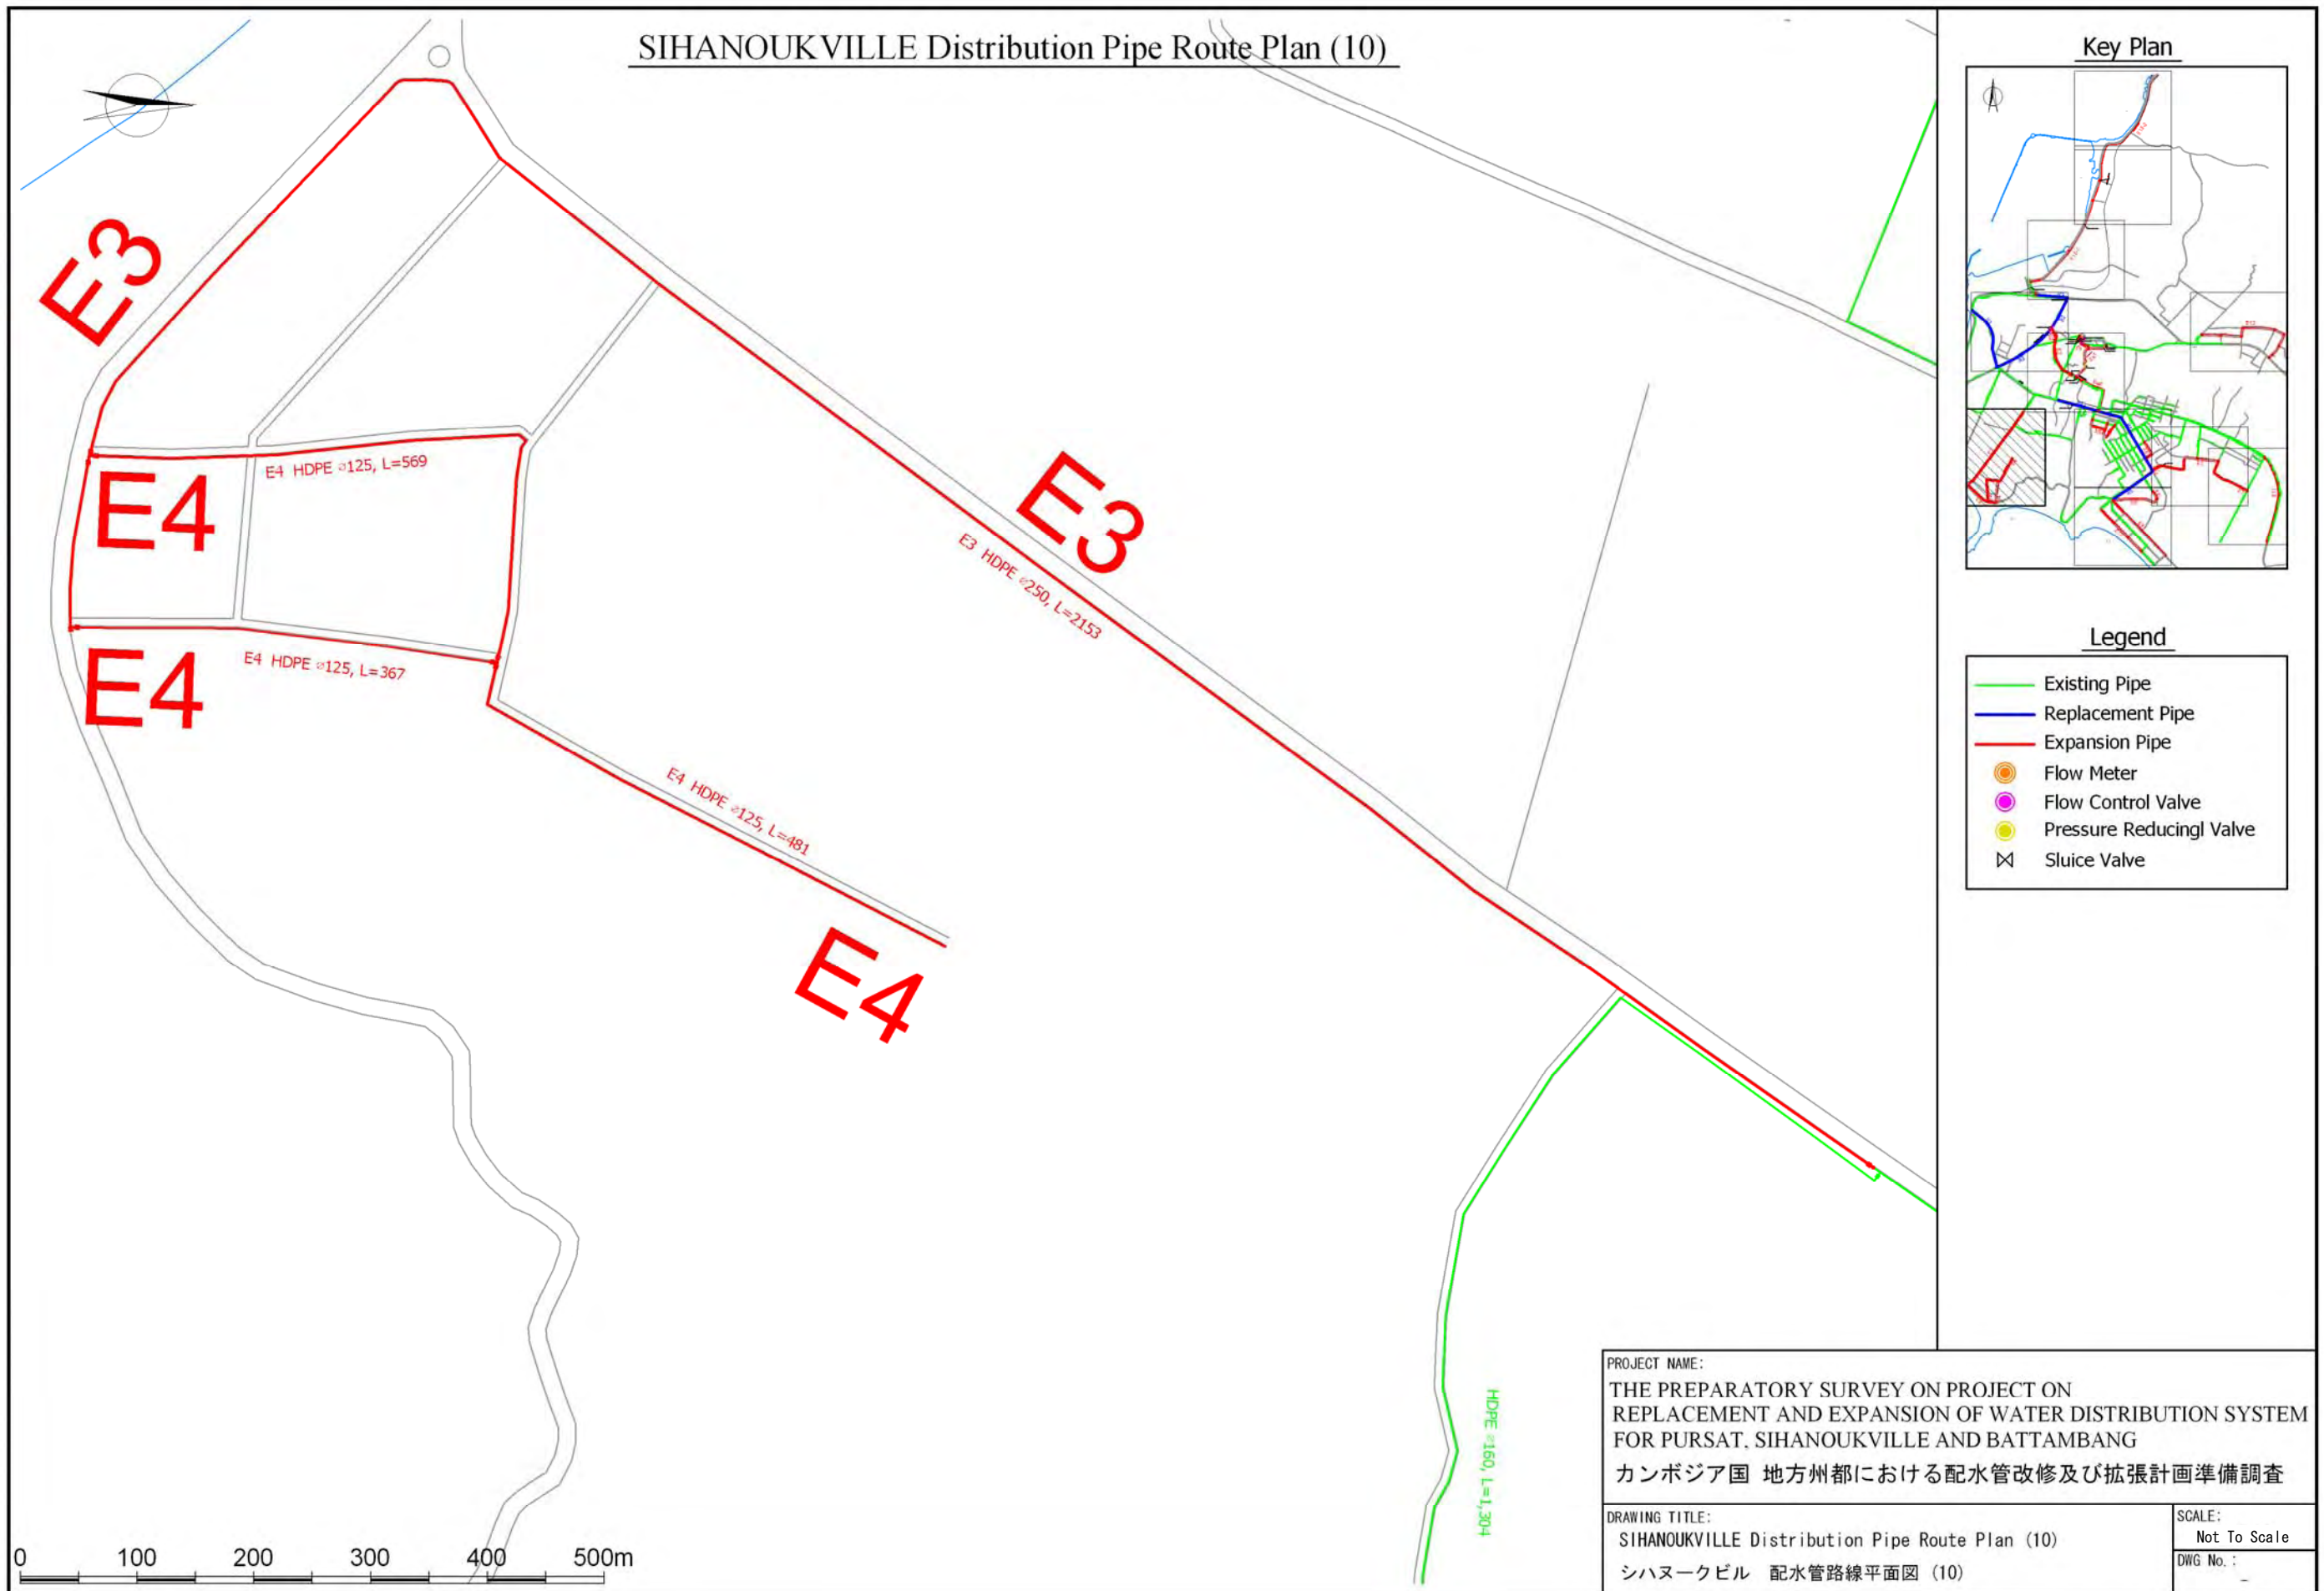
SIHANOUKVILLE Distribution Pipe Route Plan (10)
